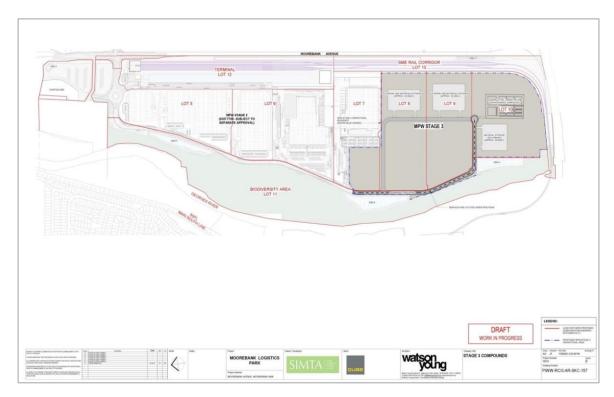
MPW3 Site Layout (Source: MPW S2 S3 CEMP, Rev R, 2 December 2022)
